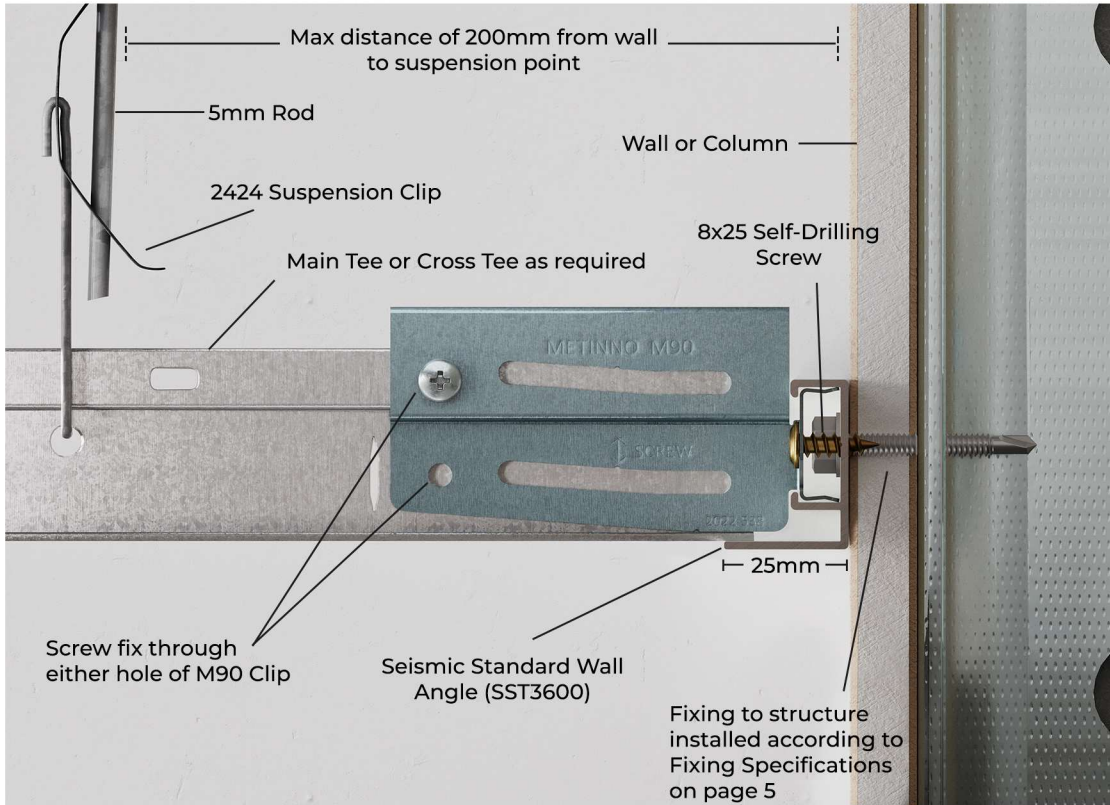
Fixed Ceiling-Wall Connection with M90 Clips
